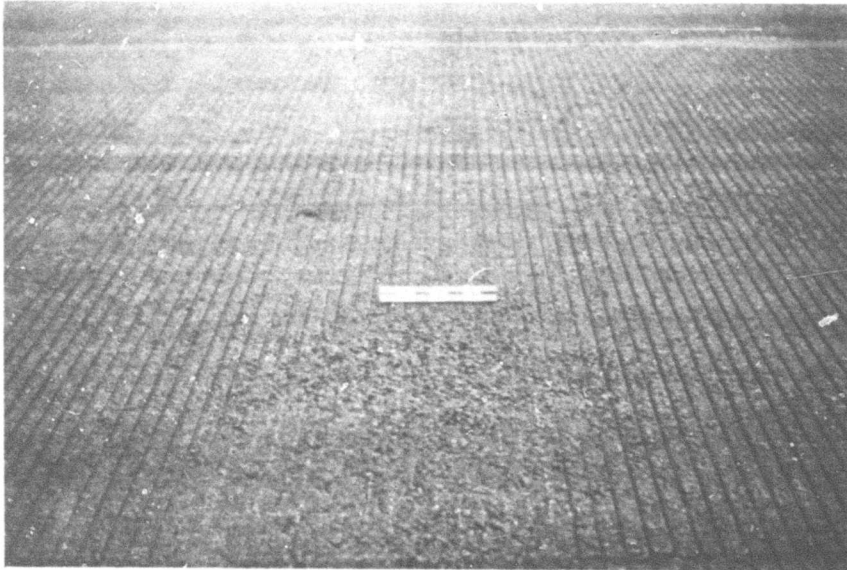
Washington National Airport -- Typical grooving in runway 18/36. Note rough textured AC pavement in foreground.
